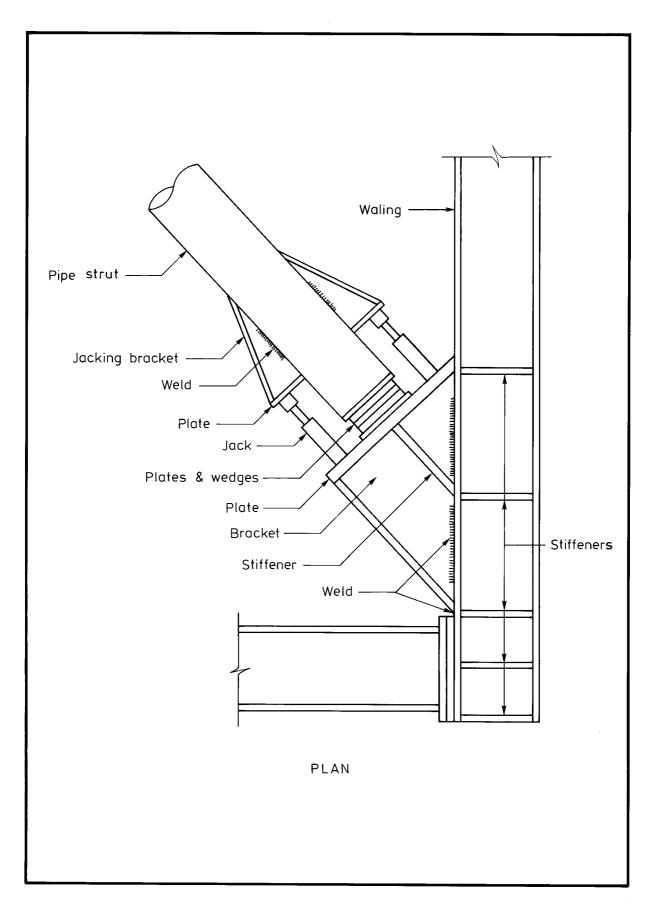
Prestressing of Pipe Strut at a Corner Using Brackets as Reaction (Goldberg et al, 1976)
